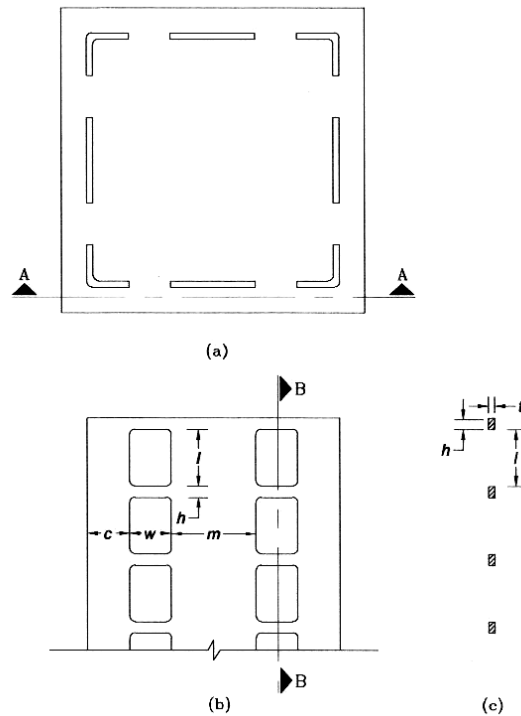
Parameters used in PCS design: (a) plan section,
